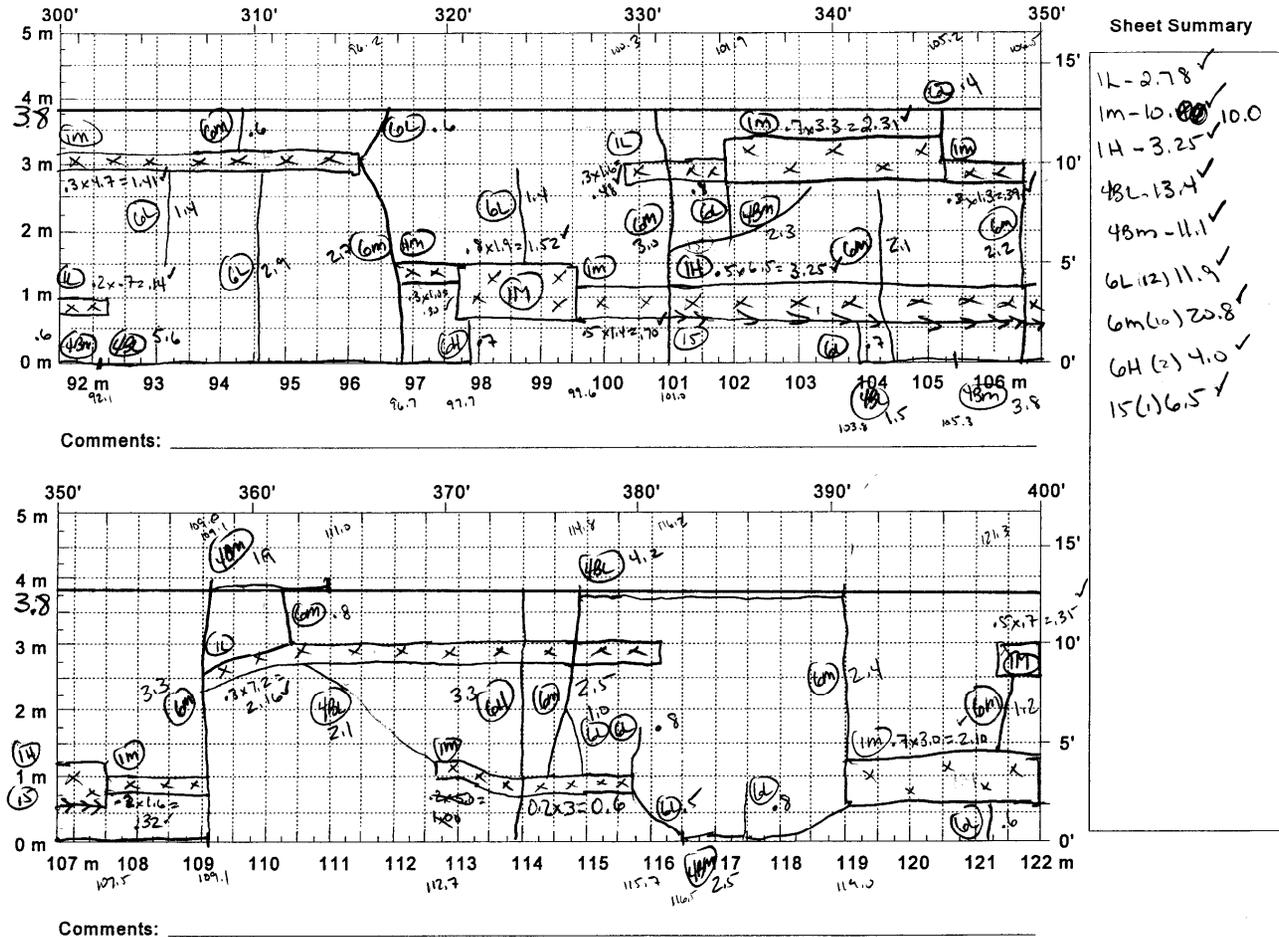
Pavement Distress Map; Station 3+00 to 4+00; Section 0509.
